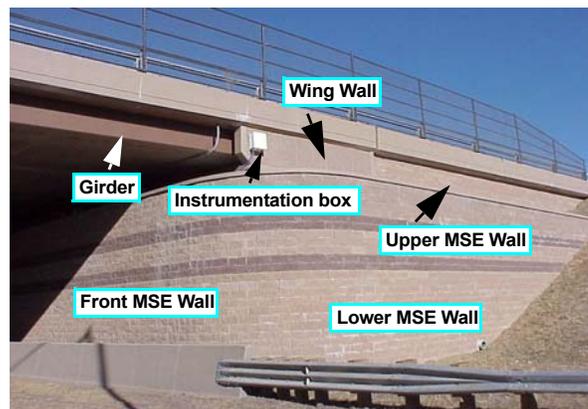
Founders/Meadows geosynthetic-reinforced bridge abutment.
